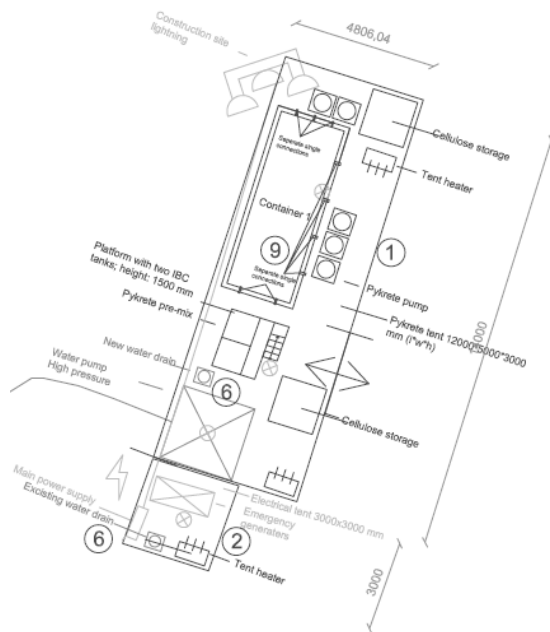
; Floor plan of construction tent source: (Moonen, 2016)
